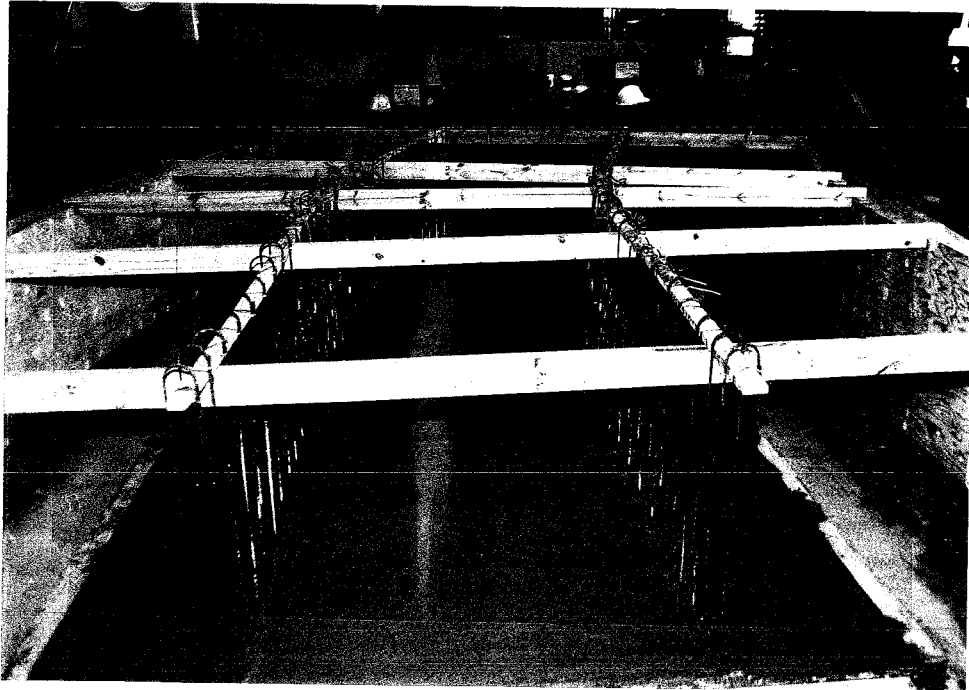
Stirrups and Jig After Casting Bottom Slab.
